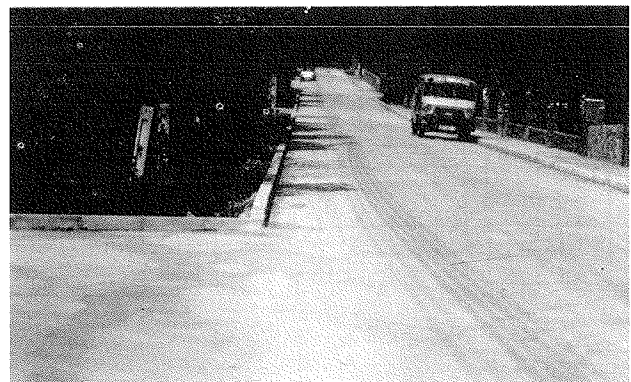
Low-volume, roller-compacted concrete roads in Spain.
